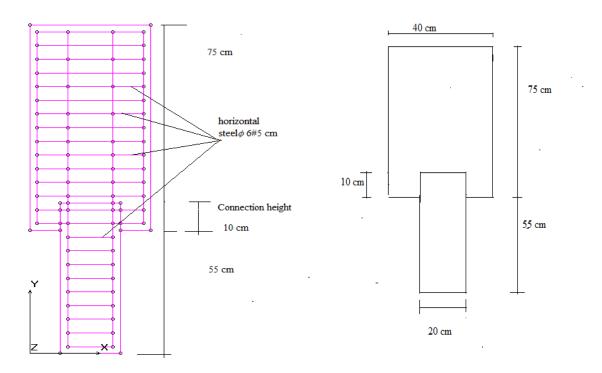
Longitudinal section for the reinforced concrete model CO4
